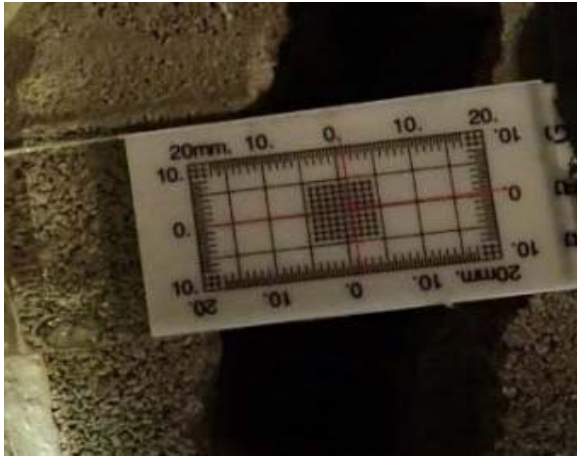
B. Crack Gauge 2 - Area F near NE corner of Electrical Room F116.
